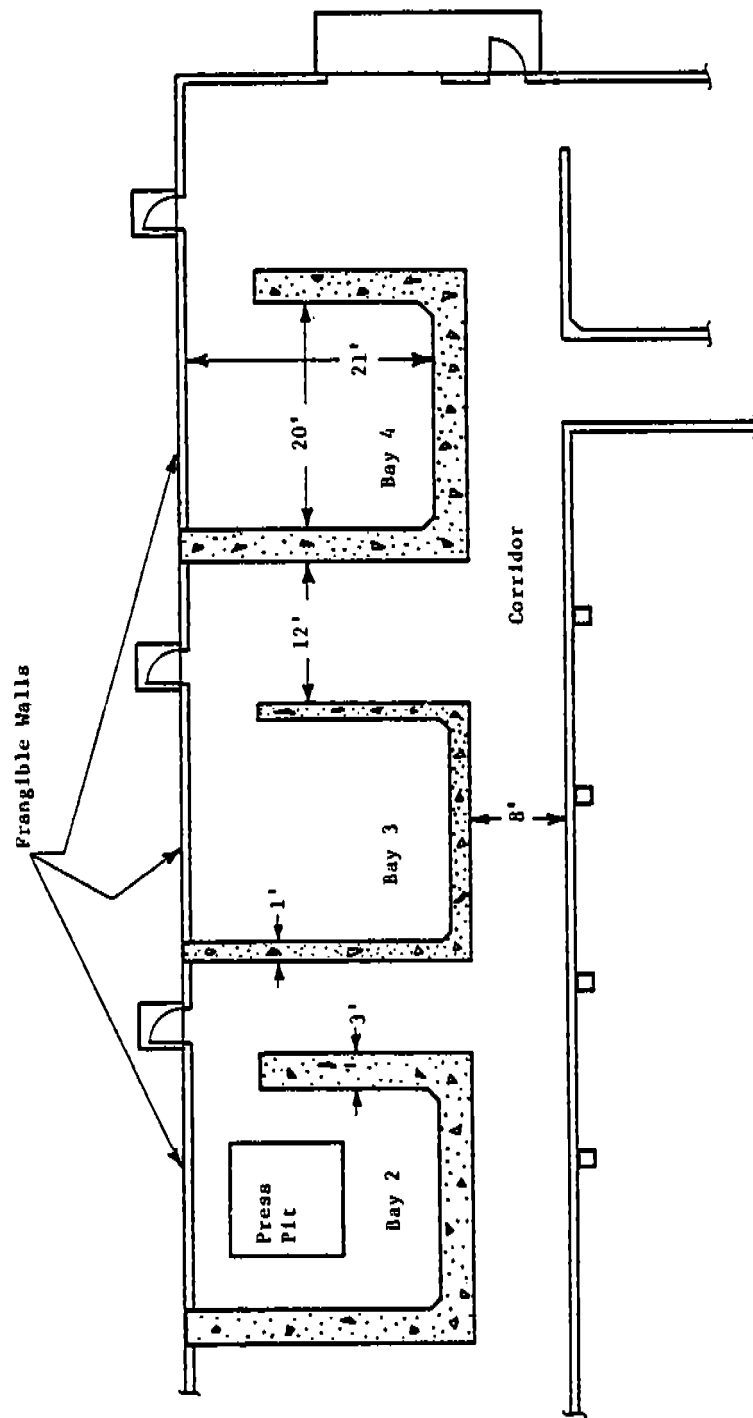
Portion of Building 11-20 Showing Multiple Bays Accessed by One Corridor
